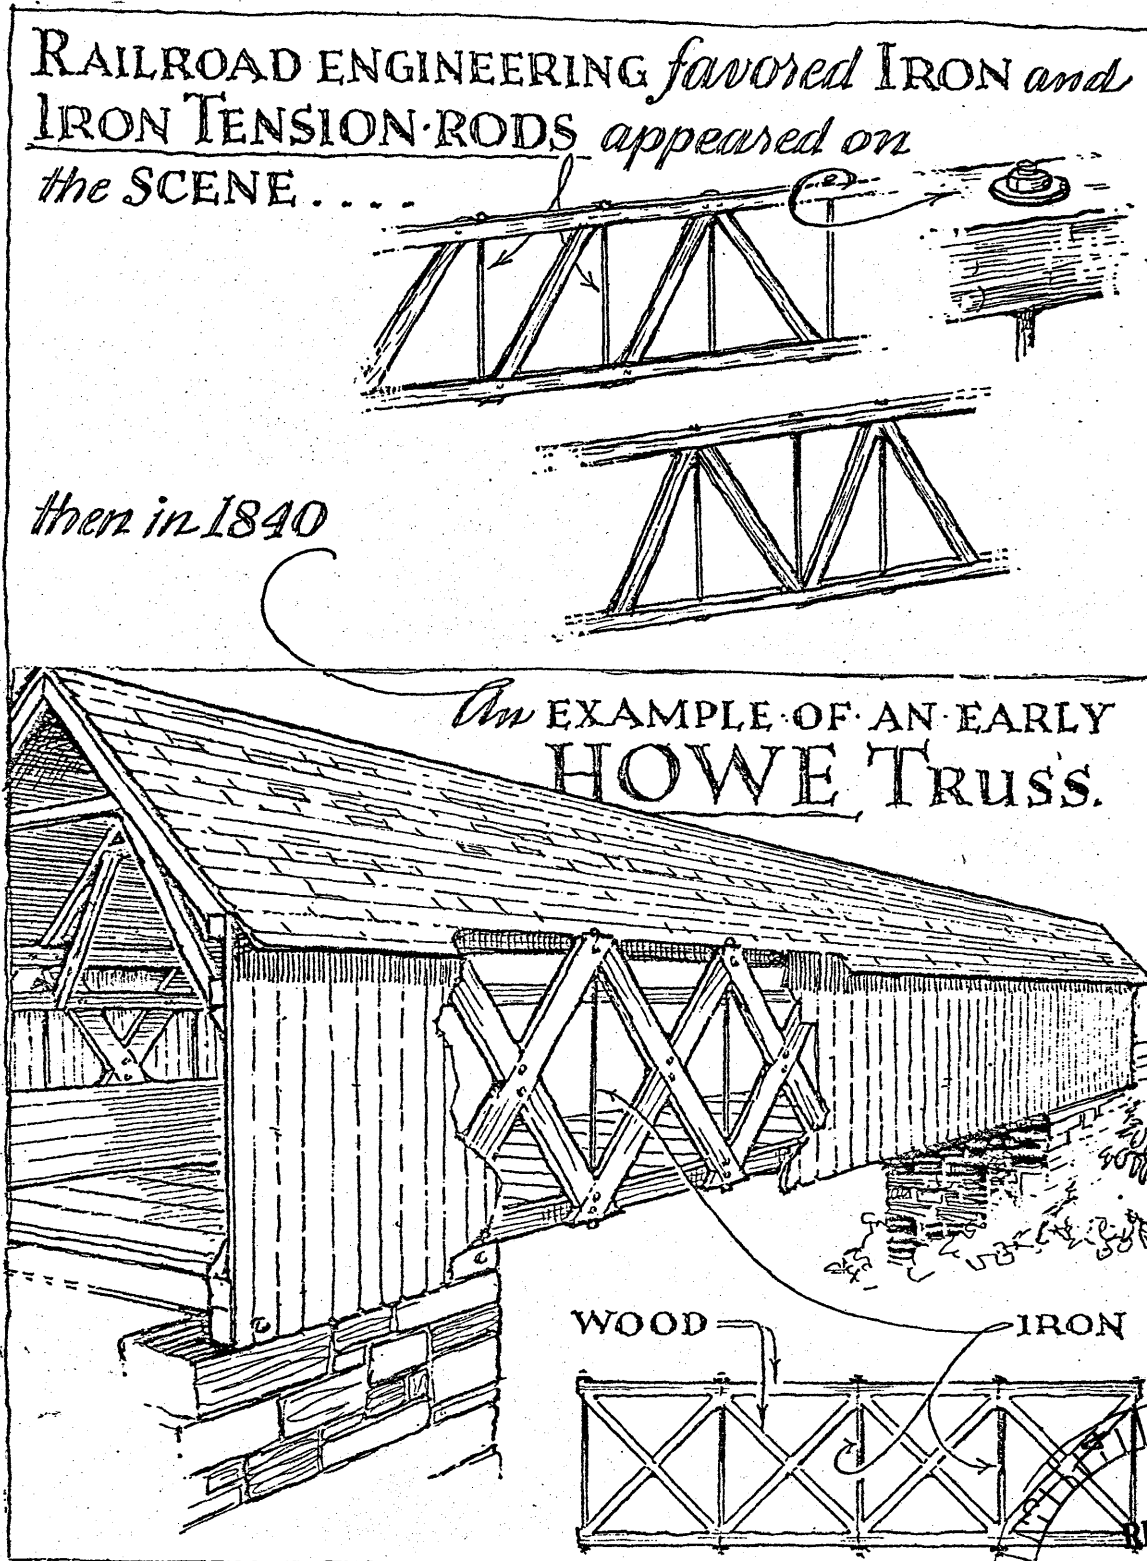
Details of the Howe Truss (after Eric Sloane)
